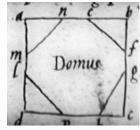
View from above of a plan of the house ceiling supports, F.193r, II.83
